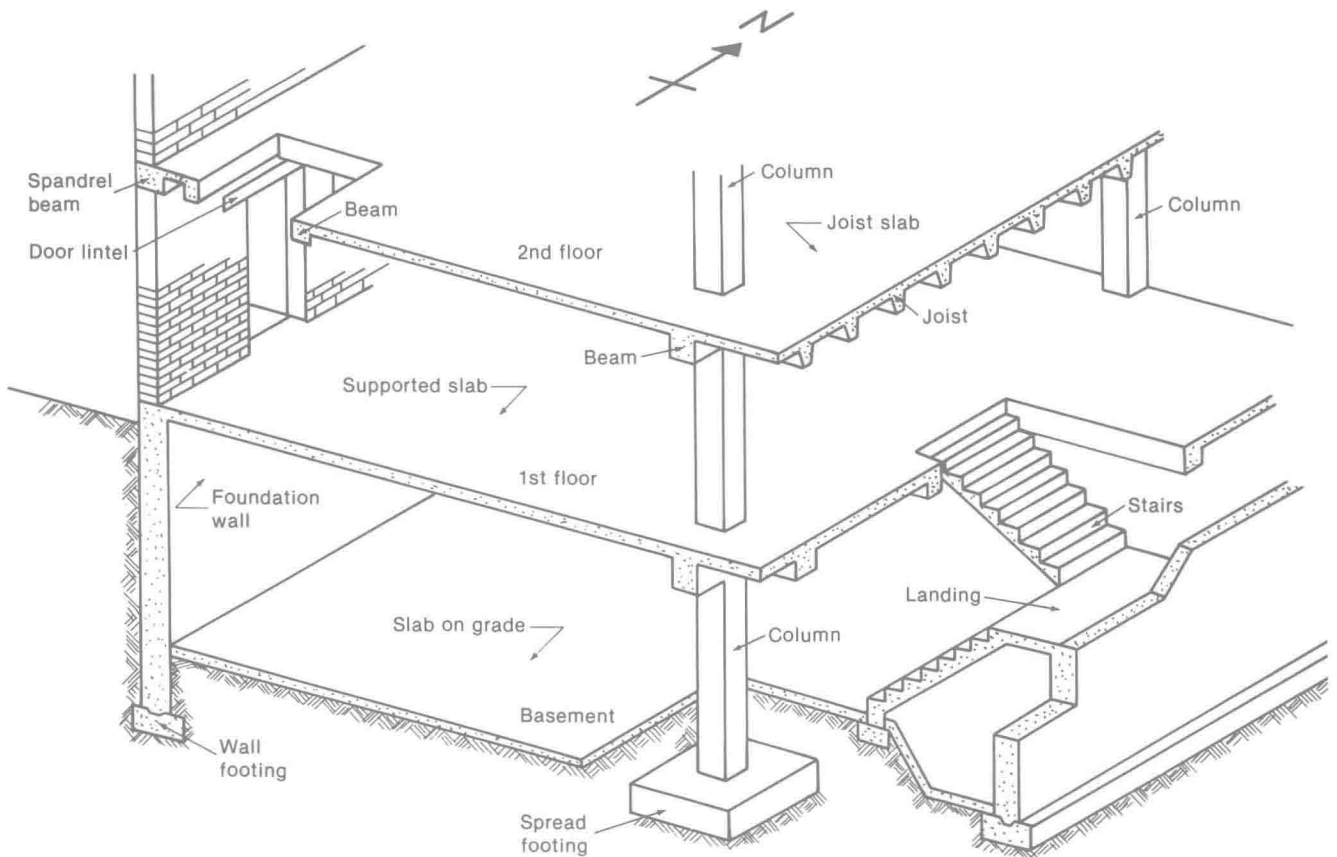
Reinforced concrete building elements. (Adapted from Ref. 1-2.)
